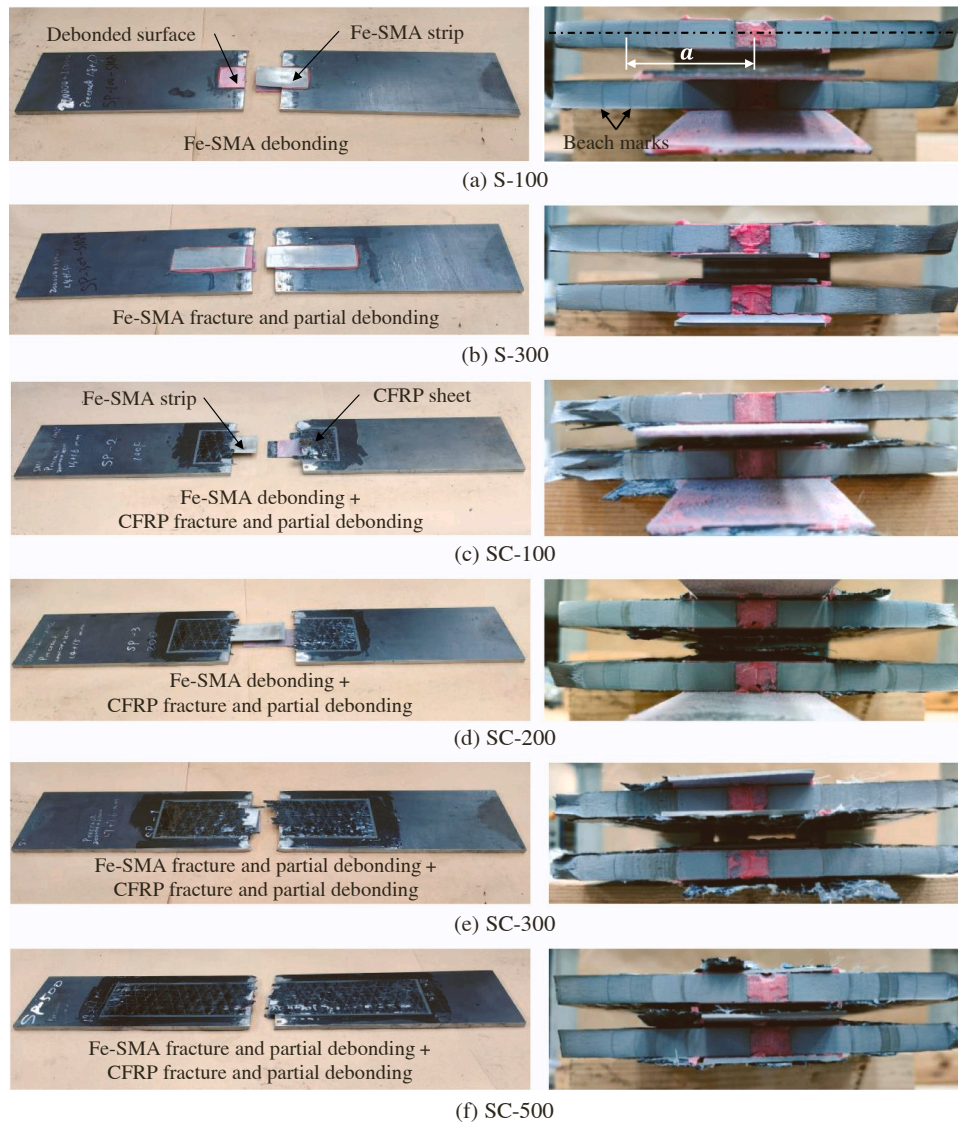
Failure modes and fracture surfaces of specimens after fatigue tests. (a) S-100. (b) S-300. (c) SC-100. (d) SC-200. (e) SC-300. (f) SC-500.
